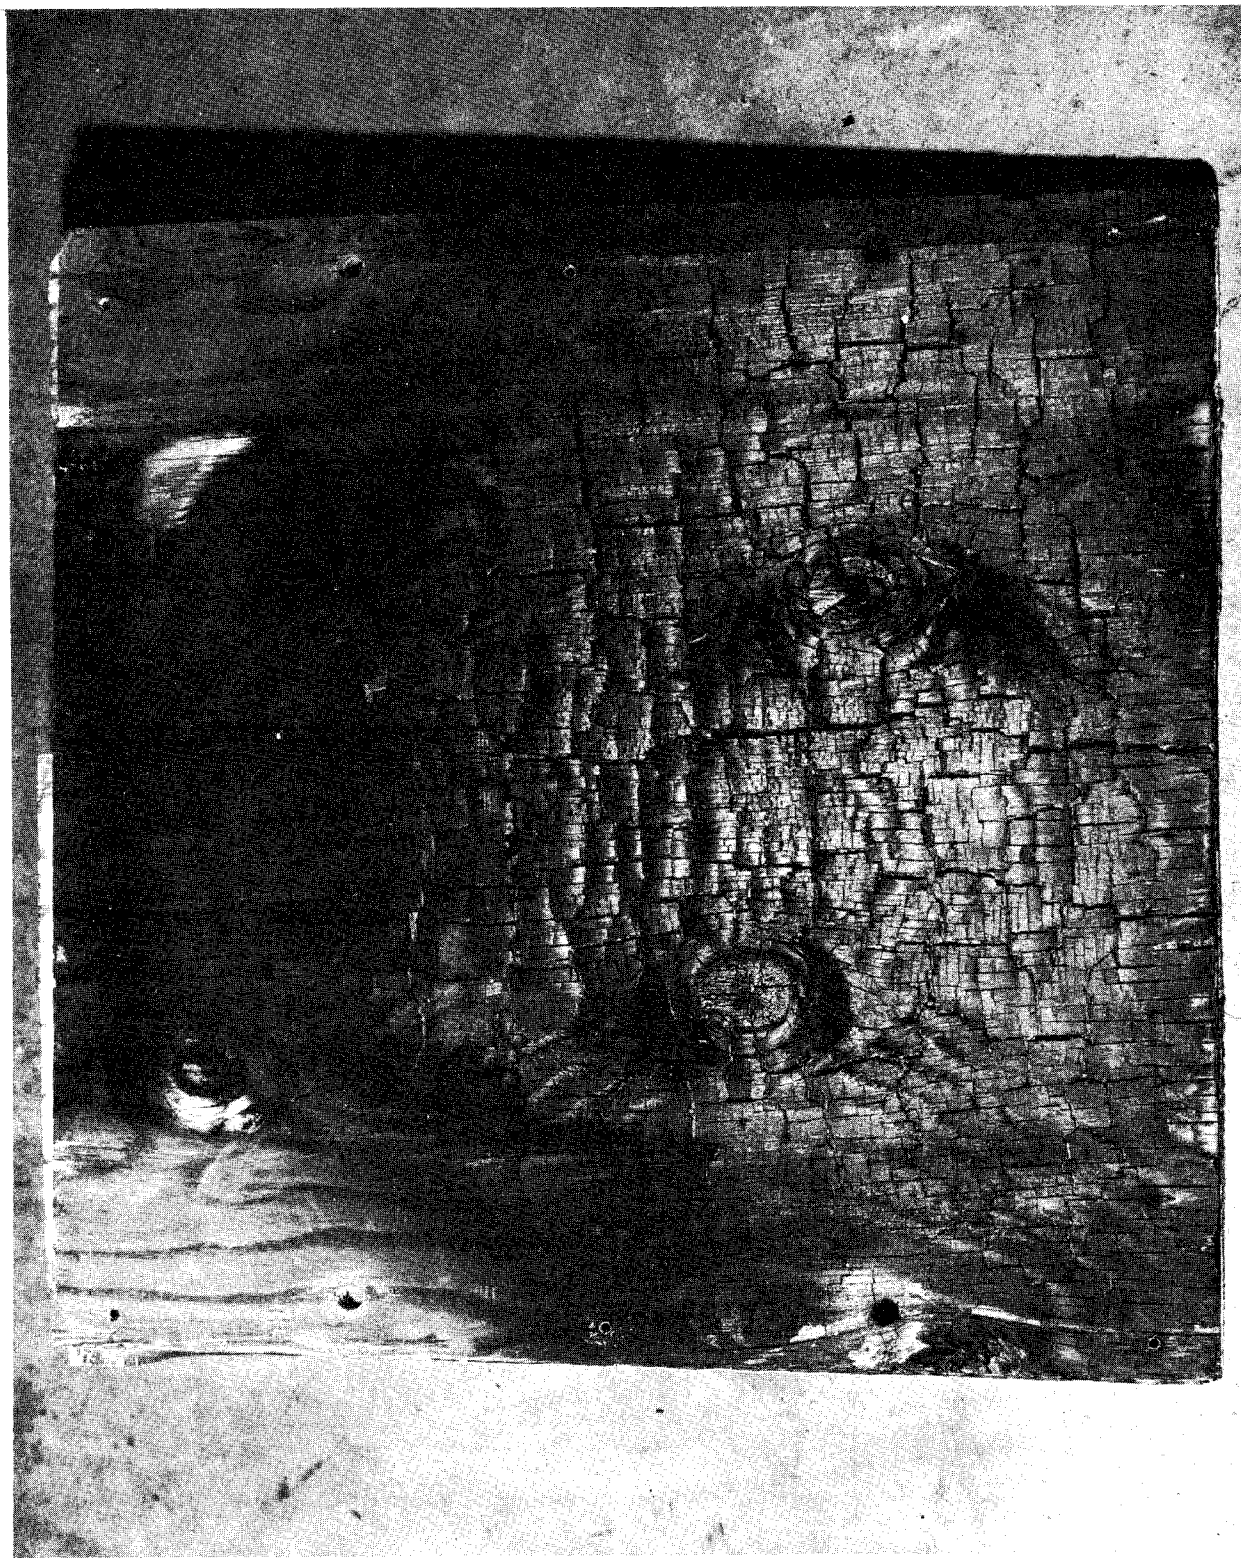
PANEL NO. 2A - 3/4-INCH-THICK PLYWOOD SUBFLOOR
